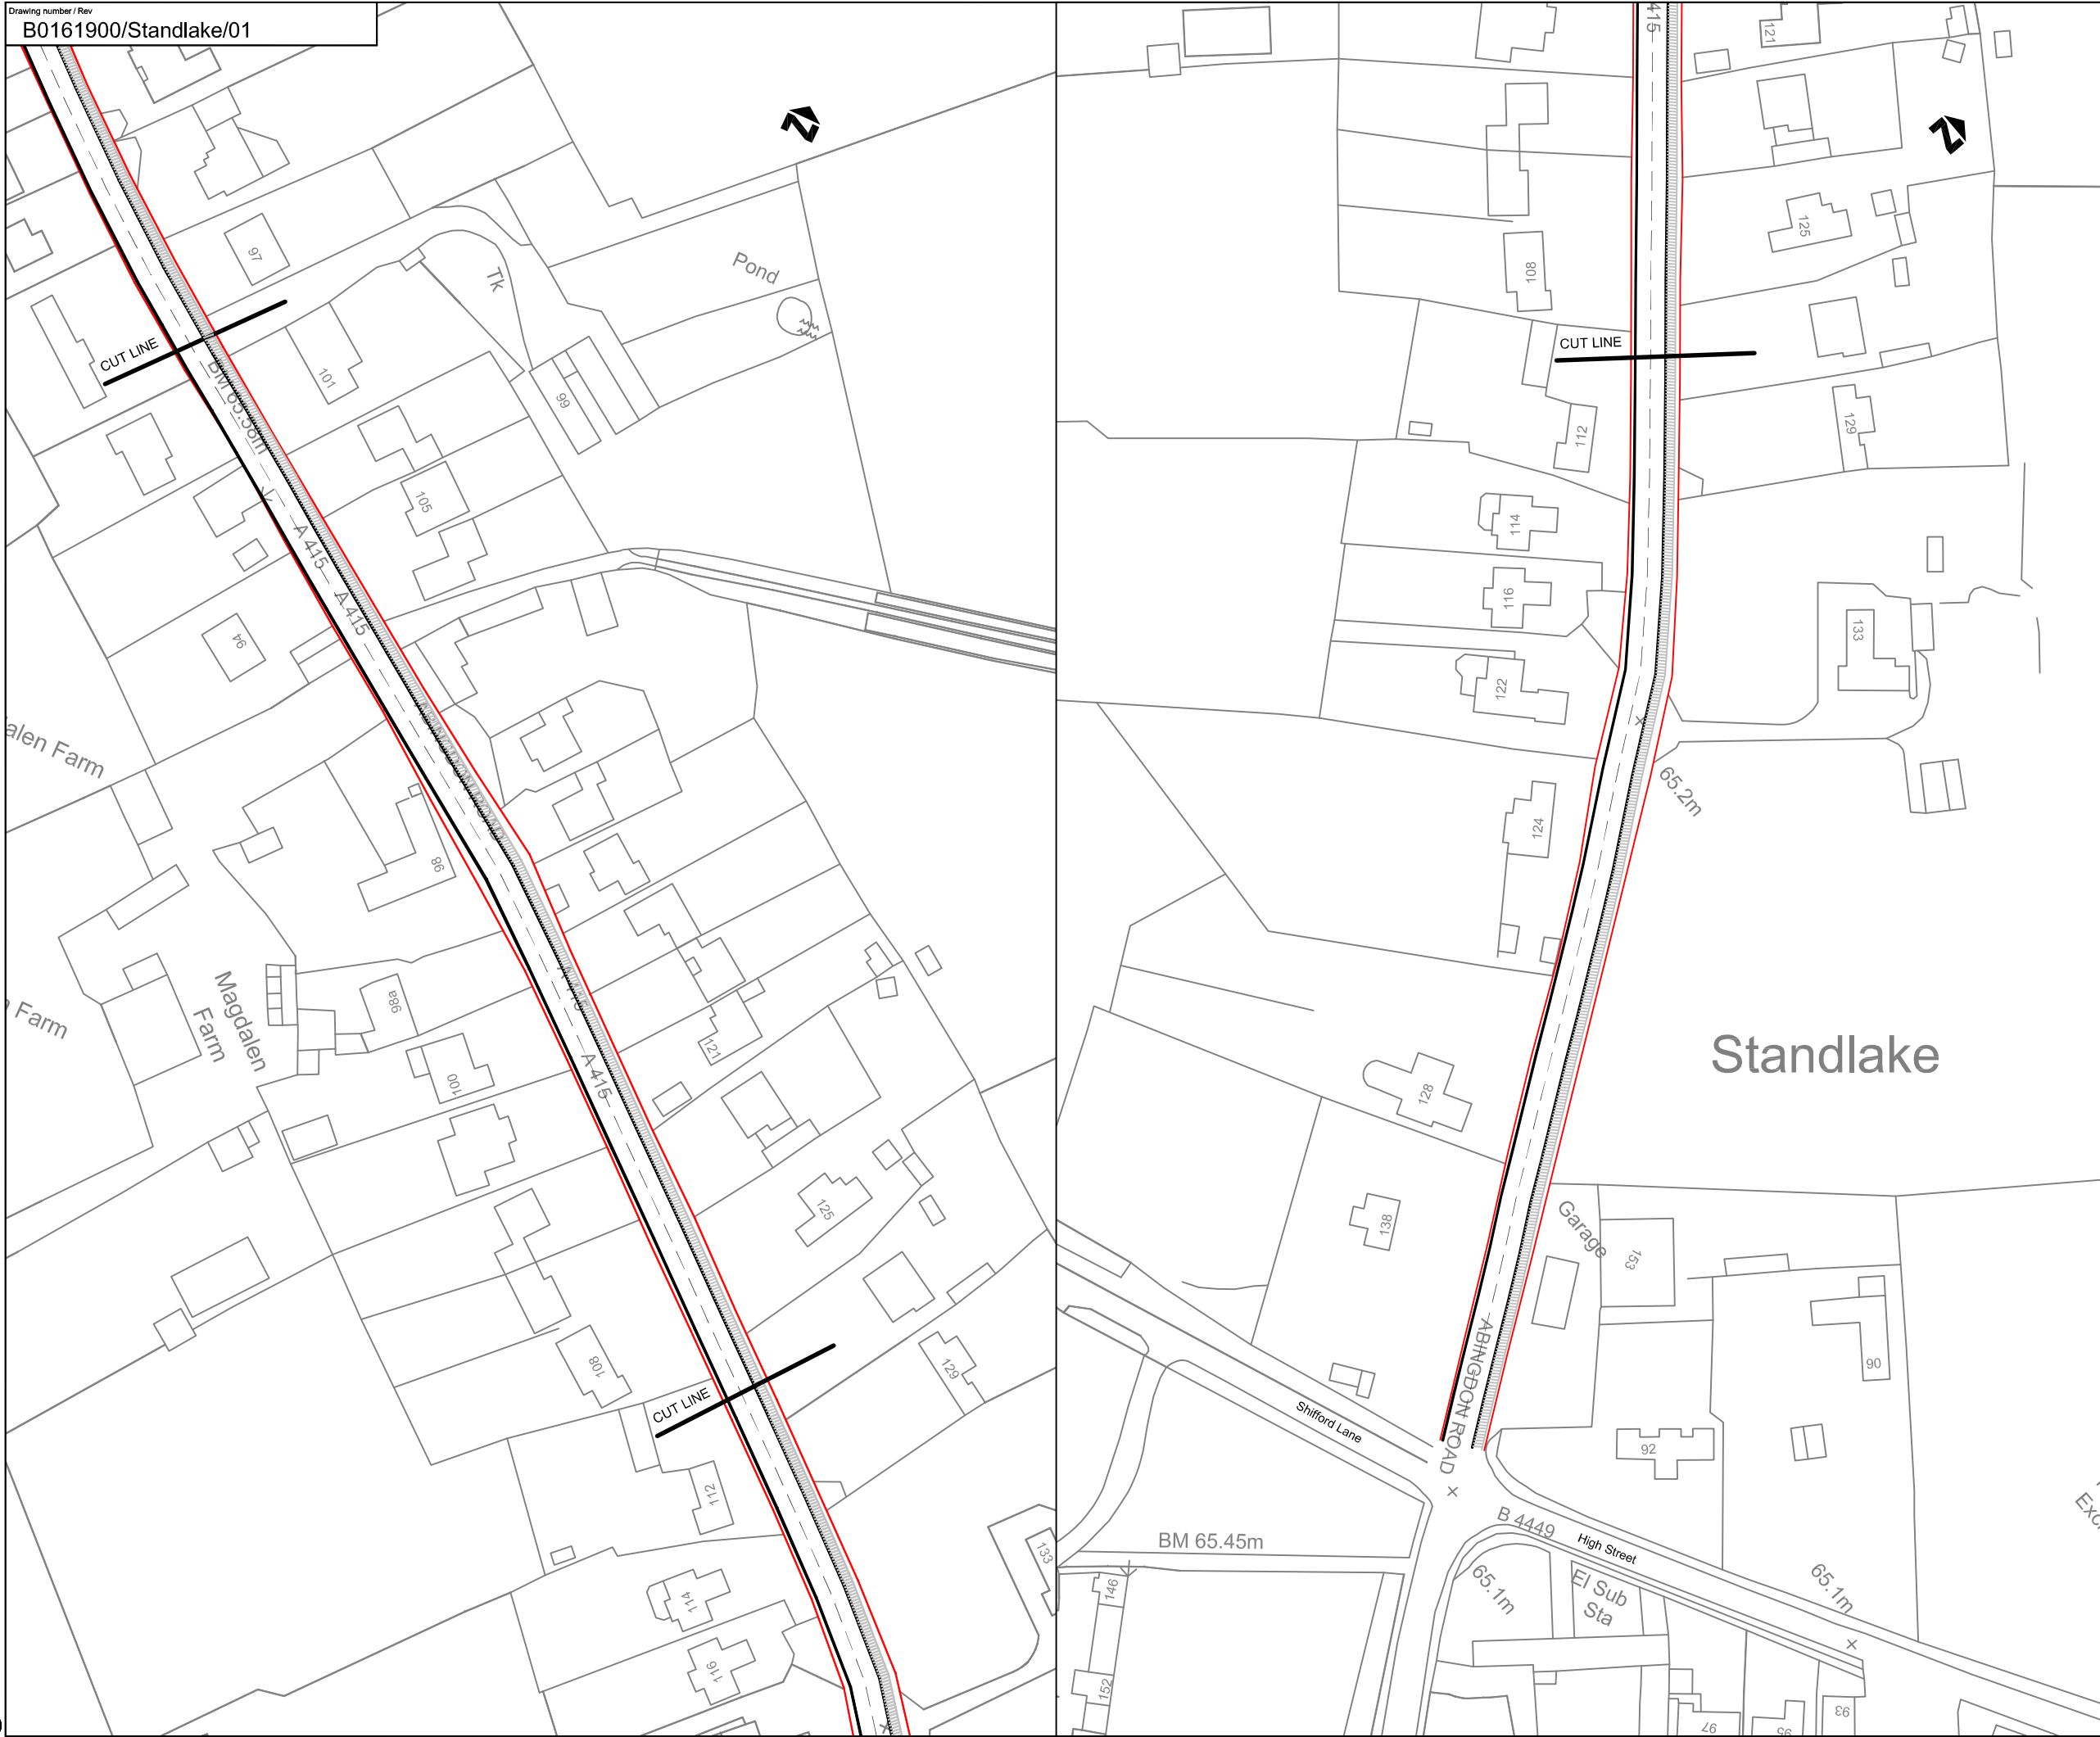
Drawing title: A415 Abingdon Road, Standlake Provision of Widened Footway and Realigned Carriageway Sheet 1 of 2
